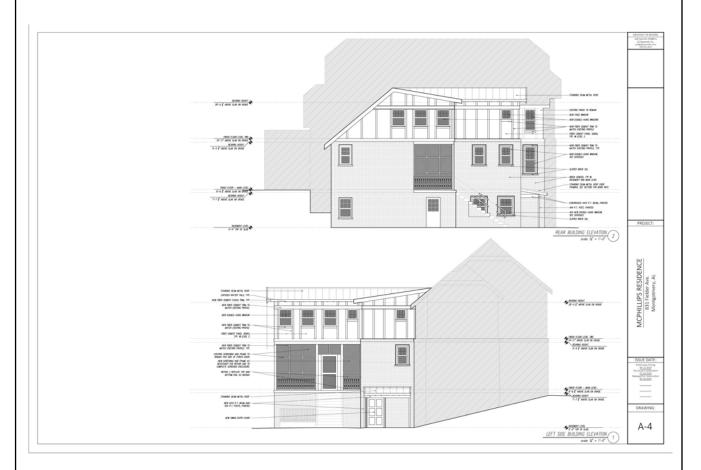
Proposed elevation drawings for 831 Felder Ave.
